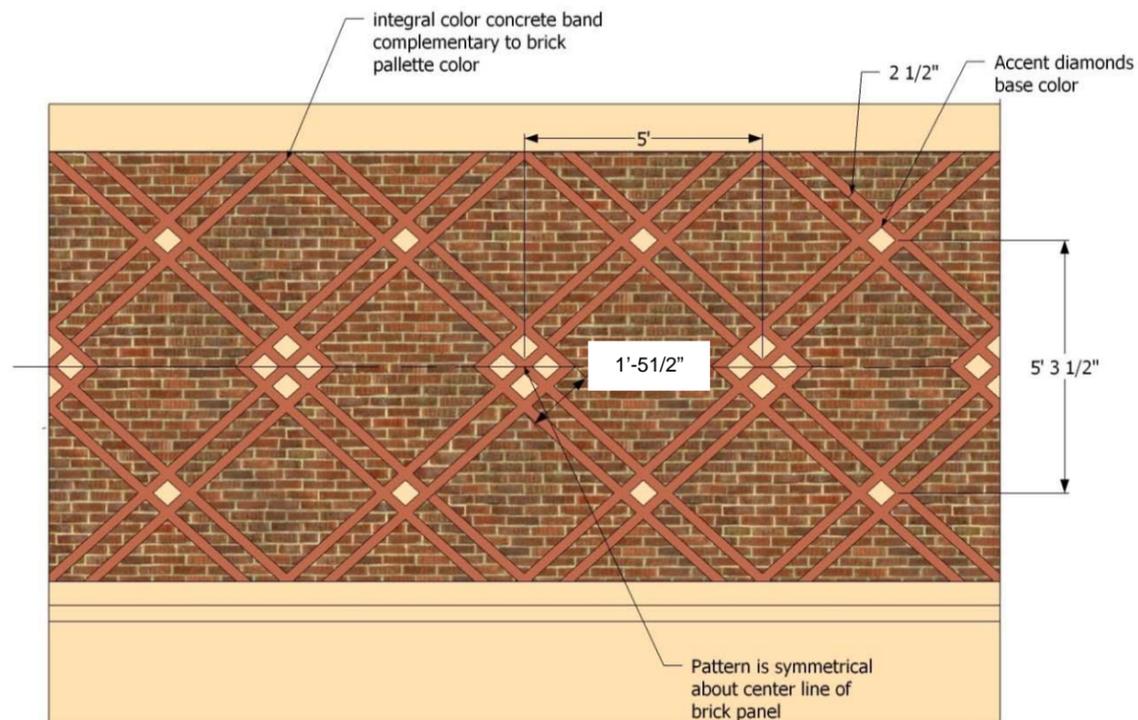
Noise Wall Detail – Double Diamond Pattern
